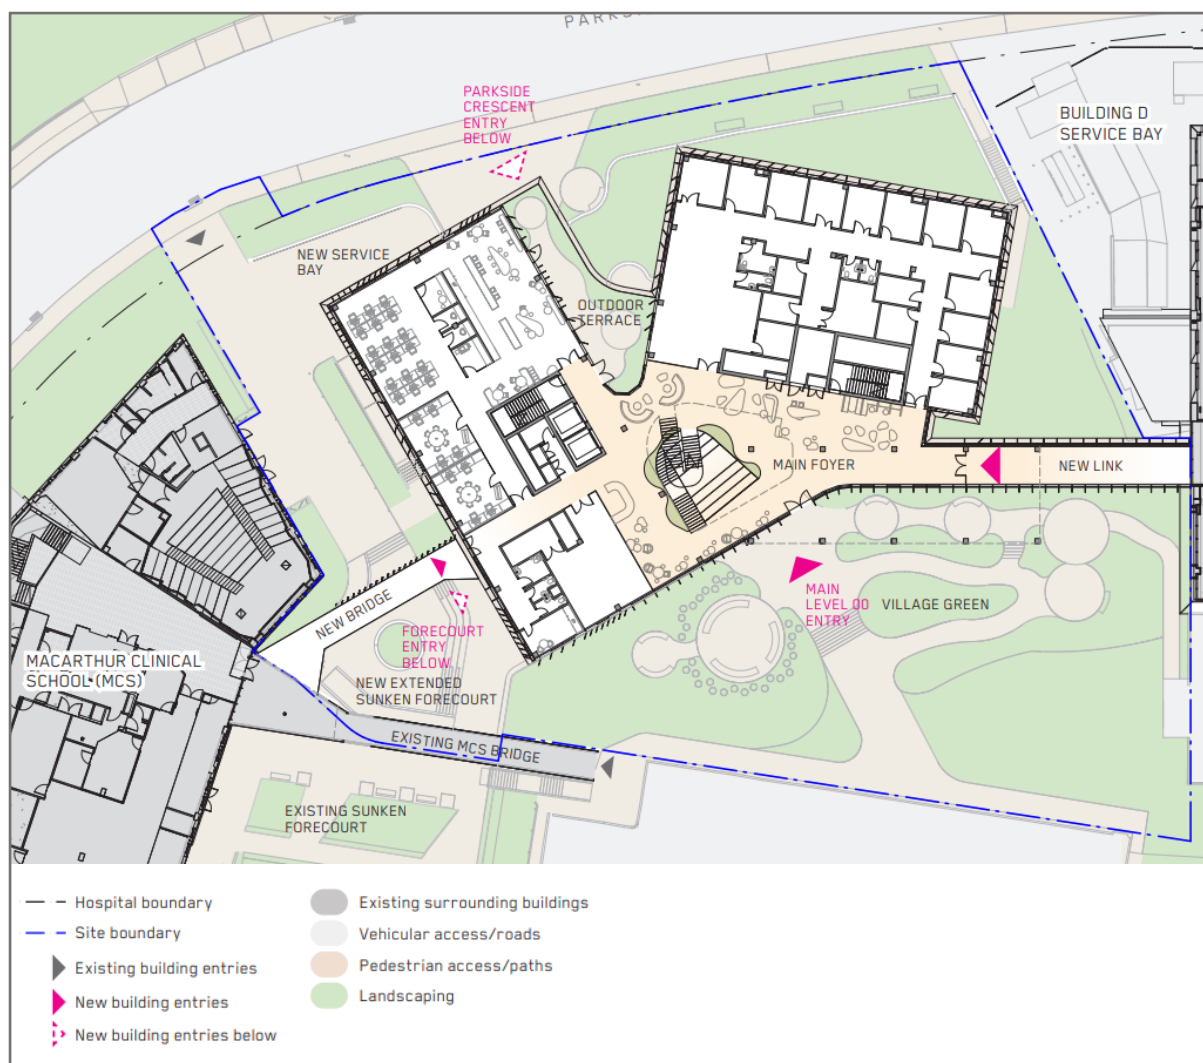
Site plan for the proposed Lang Walker AO Medical Research Building - Macarthur. Source: BVN
